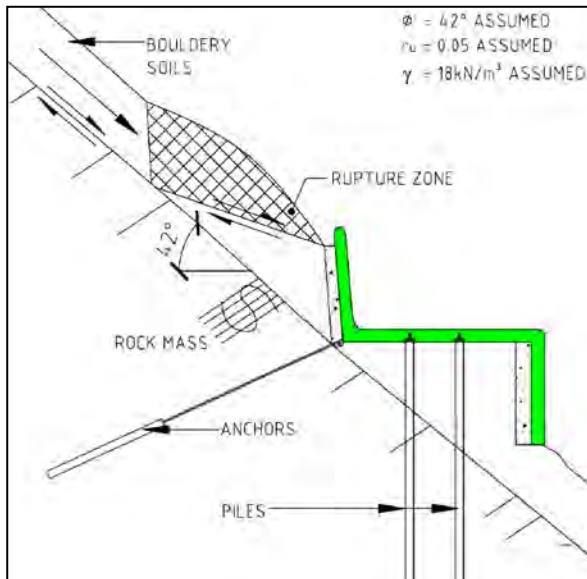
The conceptual model for stabilization of the access road across the coastal slope (Grid Ref. SS 14190 43905 to SS 14140 43958)
